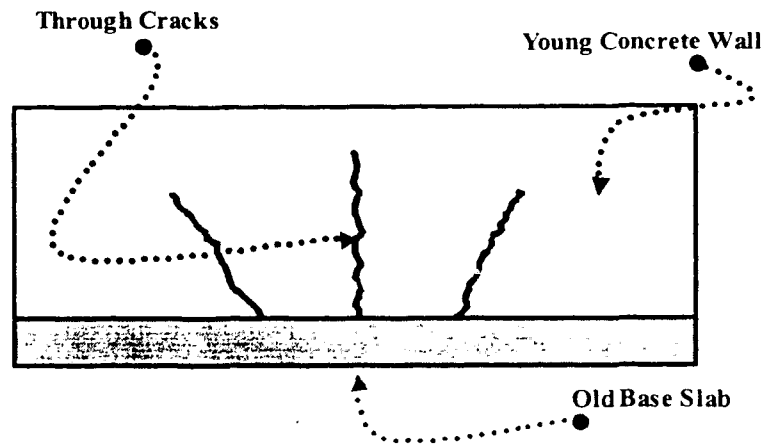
Typical external restraint condition, (new concrete wall is cast on previously cast base)
